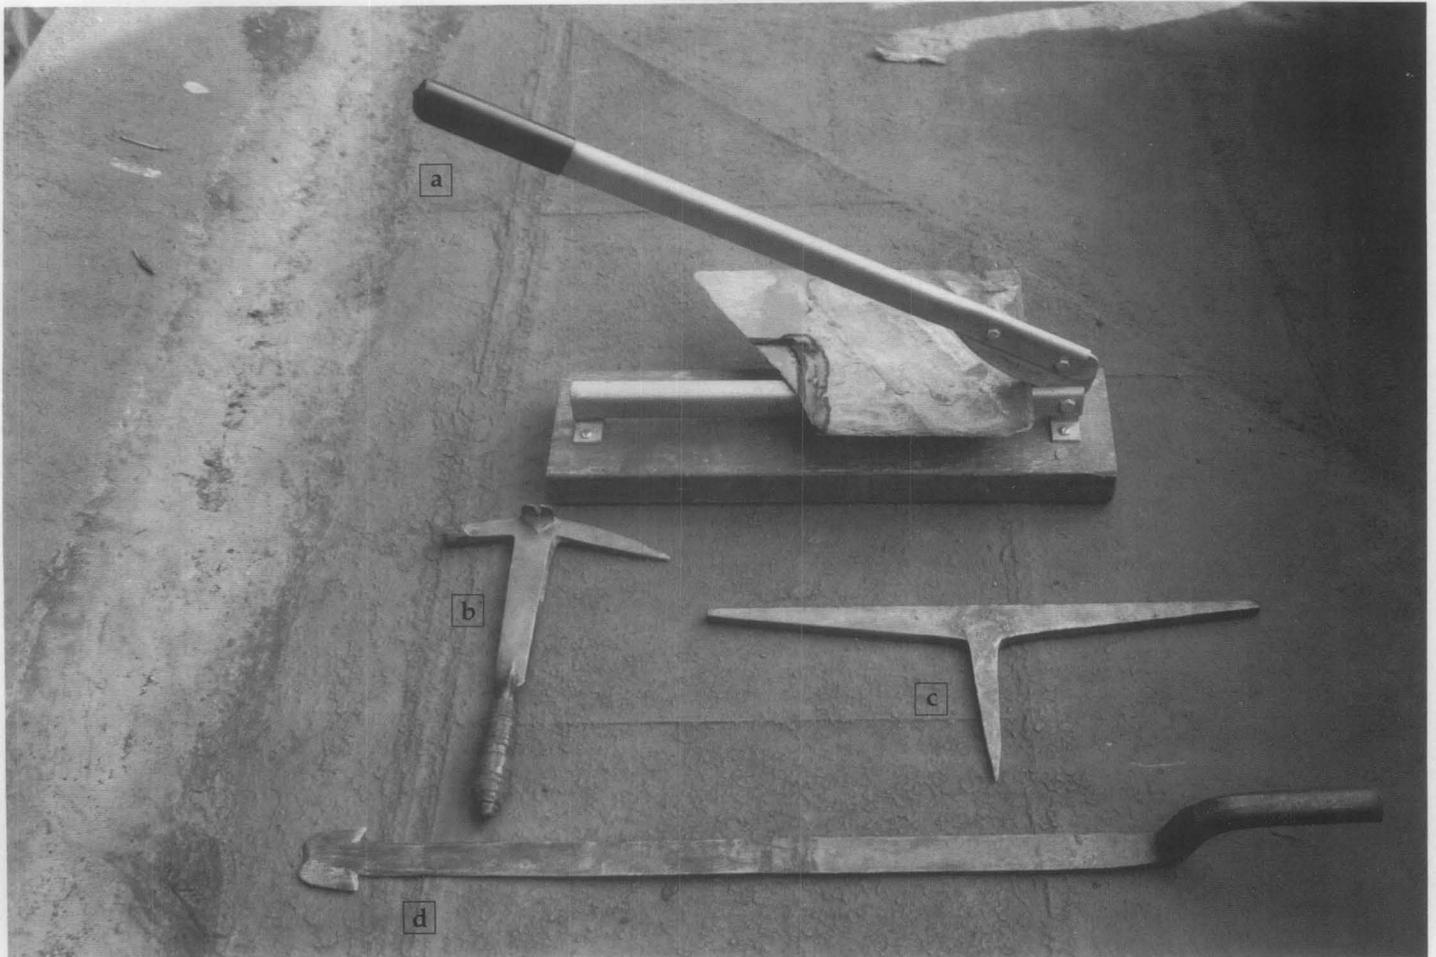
Slater's Tools. The cutter (a) is used to trim slate edges; the slate hammer (b) is used for hammering nails, trimming, cutting and punching holes in slates, and pulling roofing nails; the steak (c) is a T-shaped piece of iron upon which the slater places the edge of a slate to be trimmed; and the ripper (d) is slid under the slates to pull out the nails.
